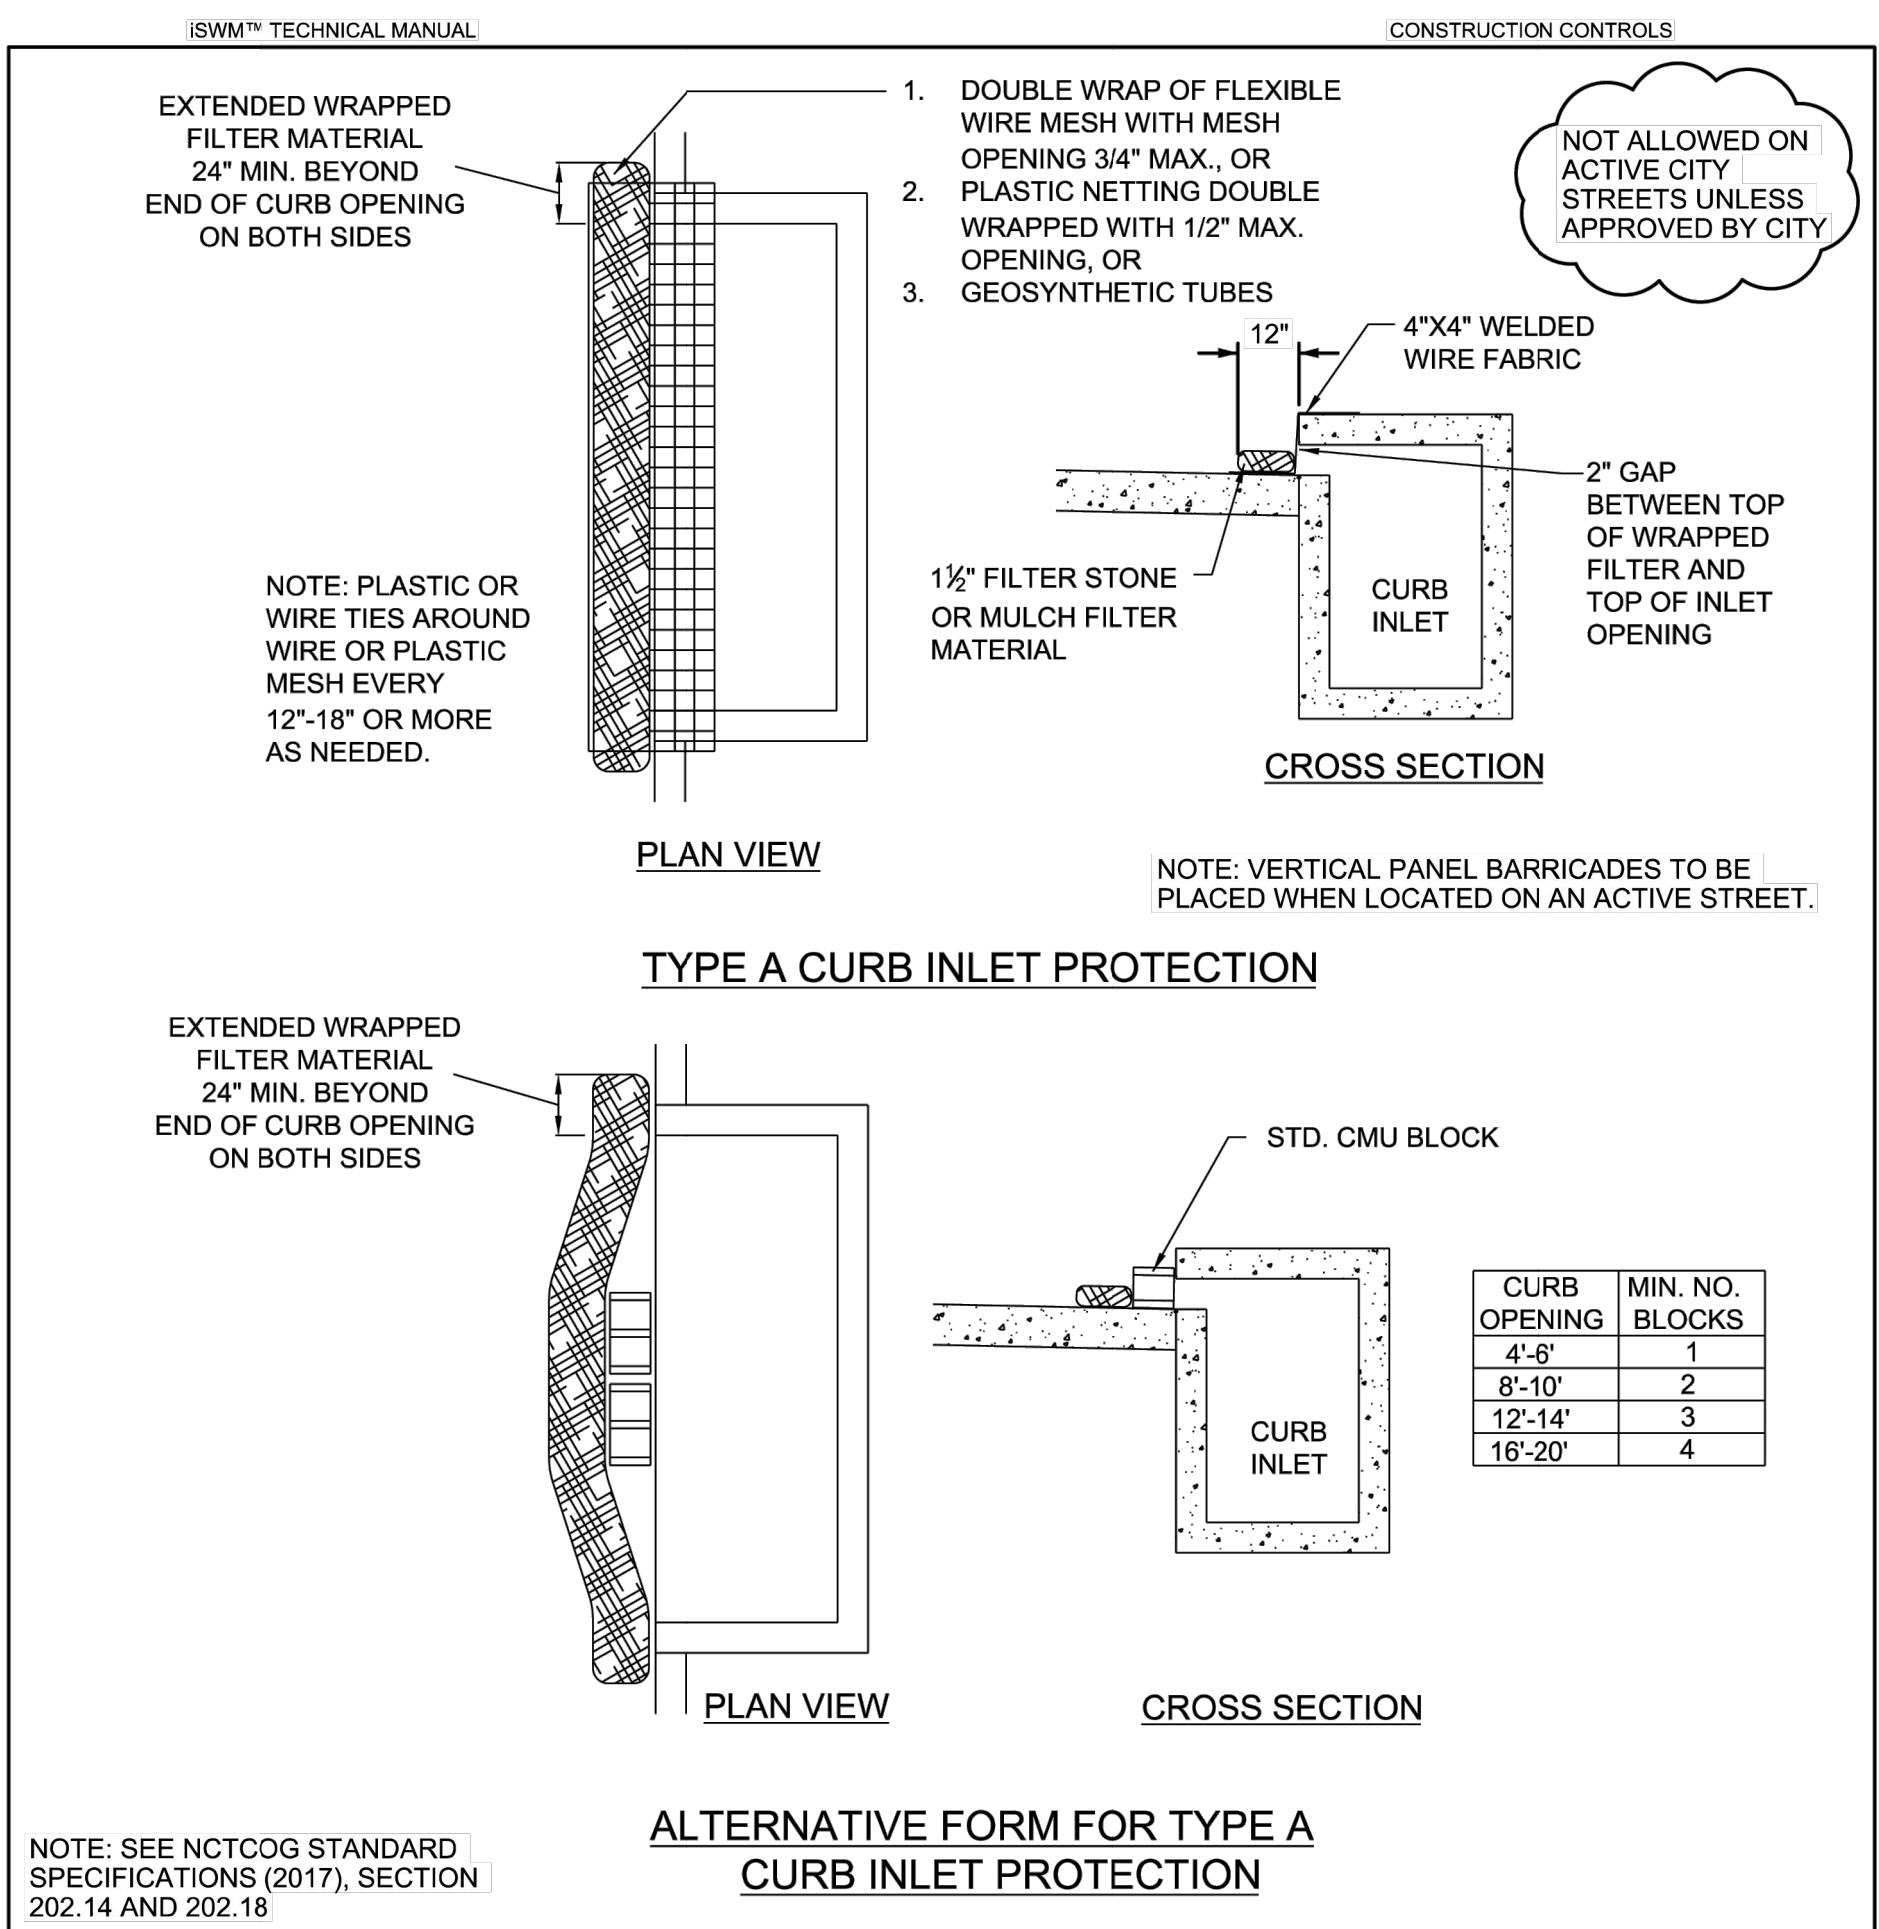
STANDARD CONSTRUCTION DETAIL - FILTER TUBE CURB INLET PROTECTION
